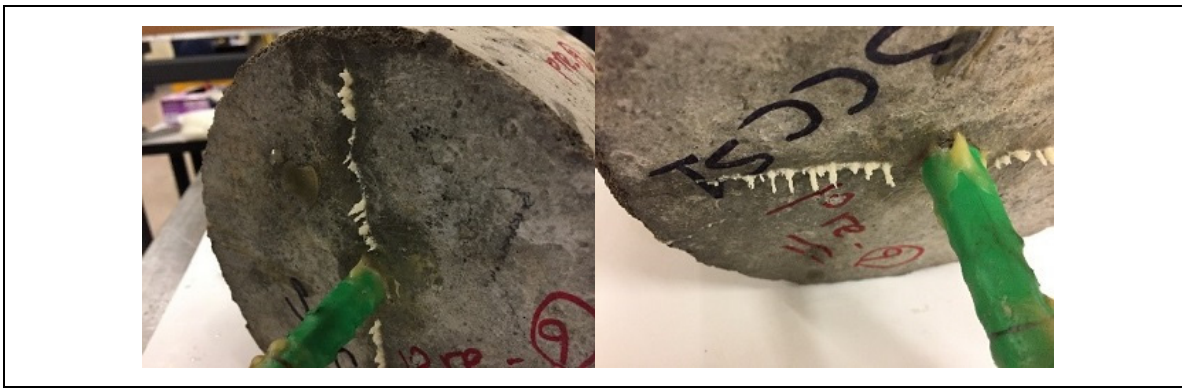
Healing products at the external crack surface of pull-out specimens of SCCSAP1 mixture
